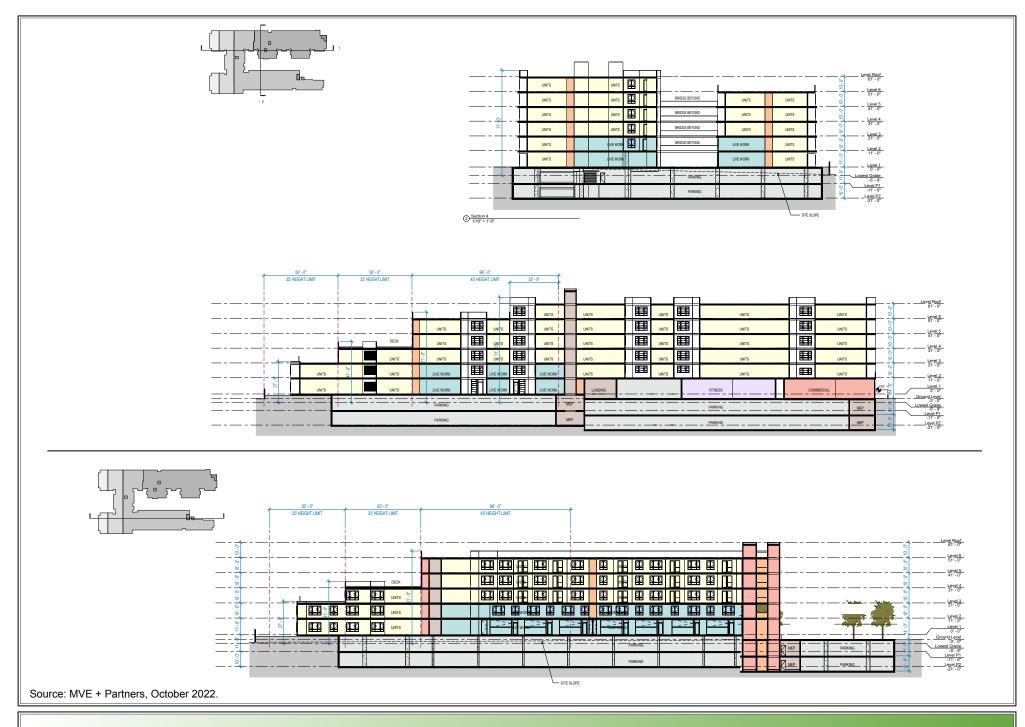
Cross Sections Therefore, the Applicant is requesting a General Plan Amendment from Limited Manufacturing and Parking Buffer to Community Commercial, a Zone Change, and a Height District Change to allow for the entire Project Site to be changed to C2-1VL. The C2-1VL zone permits the minimum lot area per dwelling unit to be 400 square feet, which provides for 243 residential units on the 97,264 square foot Project Site.
